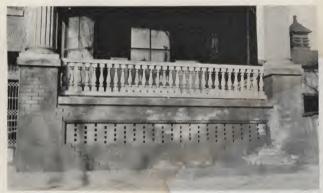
The stone coping has broken loose from the adjoining masonry, allowing water to enter the brickwork.
